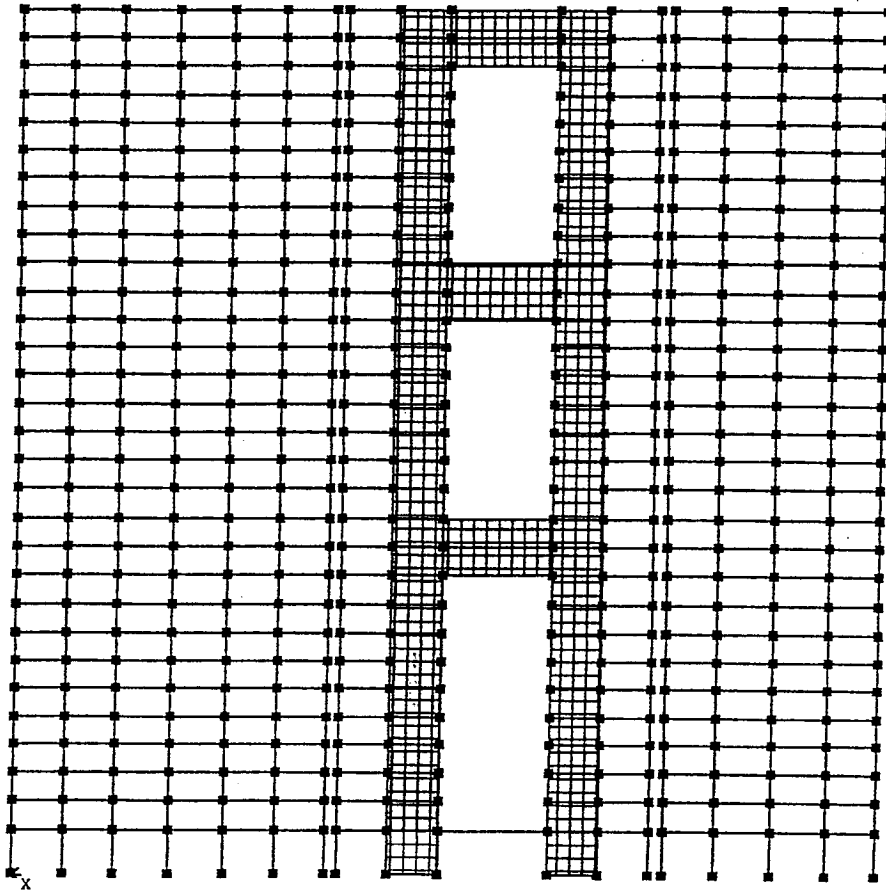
Retrofitted S-K Redesigned Building, Third Point Coupled Shear Walls
